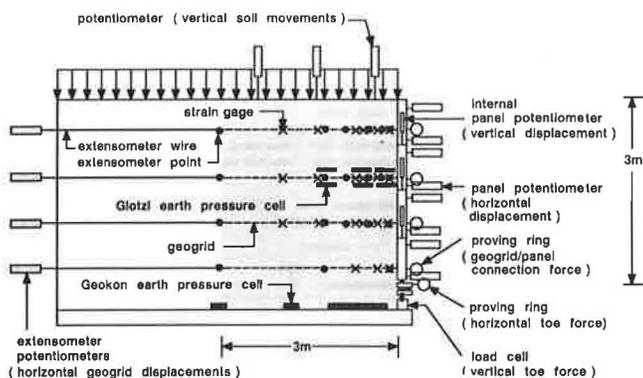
Typical layout of principal instrumentation for incremental panel wall test.
